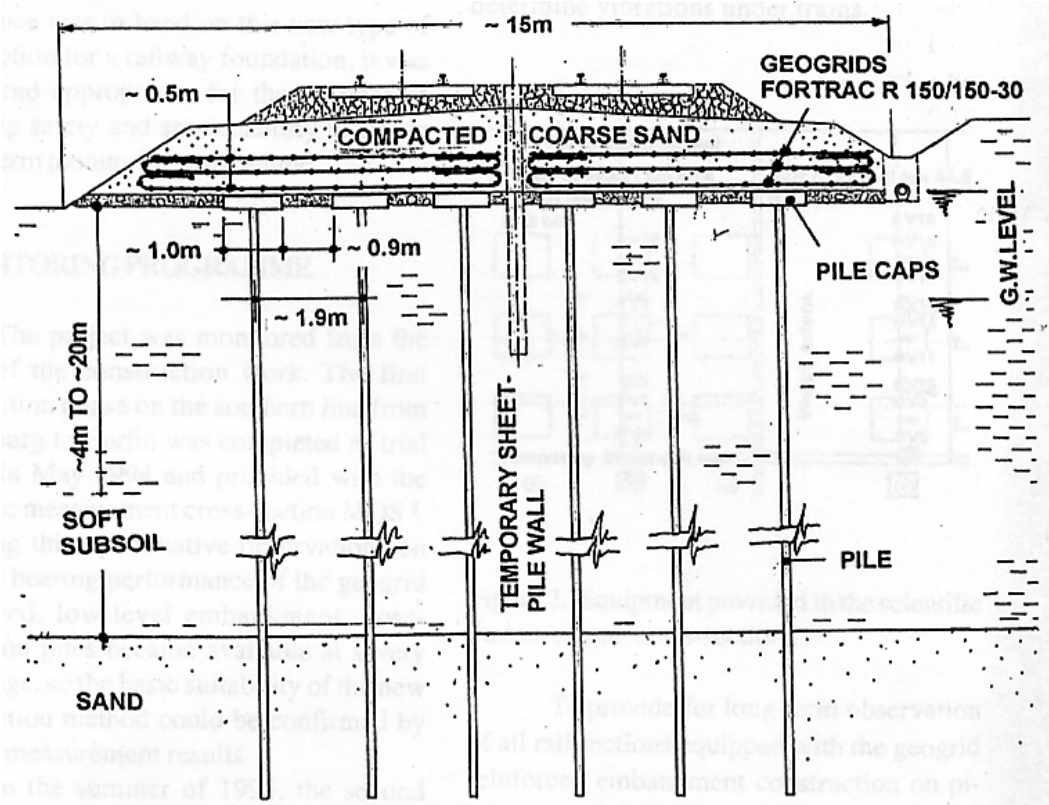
Railway on Geogrid-Reinforced and Pile-Supported Embankment (Alexiew and Gartung, 1999)
